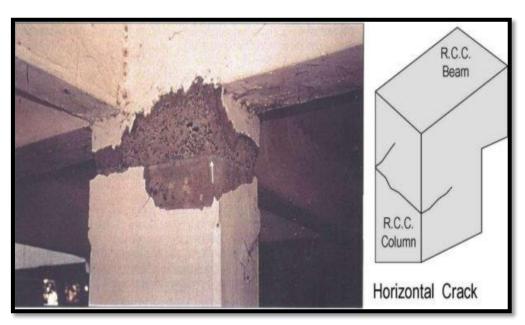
Horizontal Crack In The Concrete Column [3] [4]
